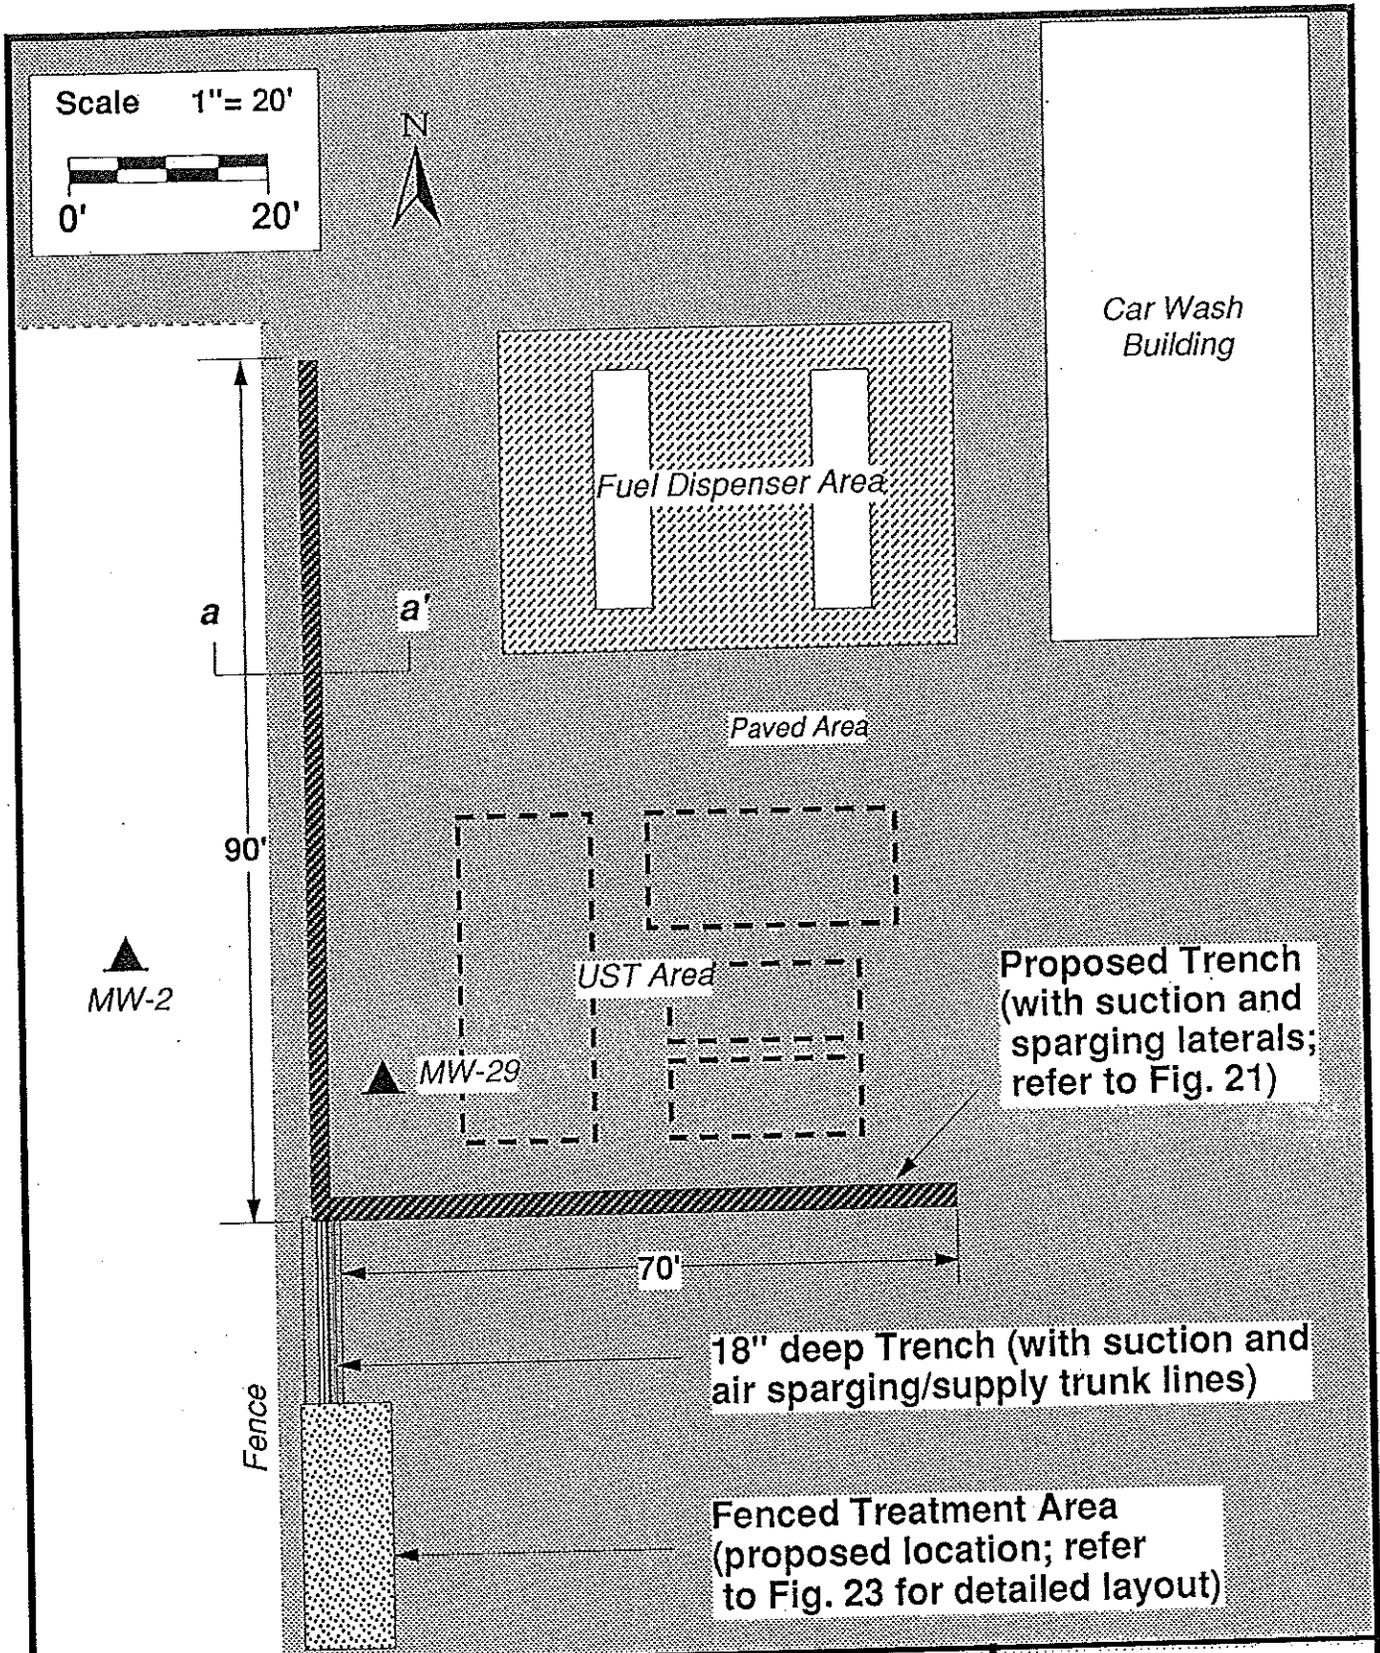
Plan View of Conceptual Treatment Design, Tiki Car Wash, Bellevue, Washington
